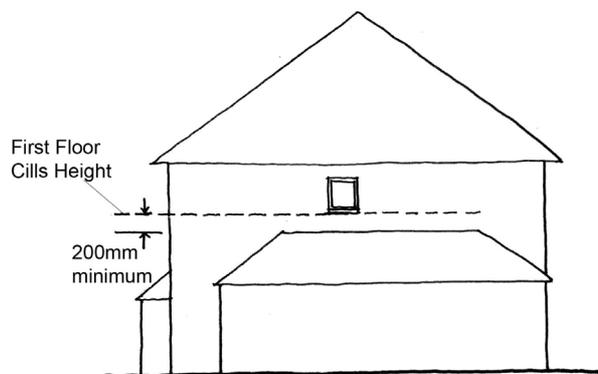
The highest part of single-storey rear extensions should be set below the first floor cills by at least 200mm.
